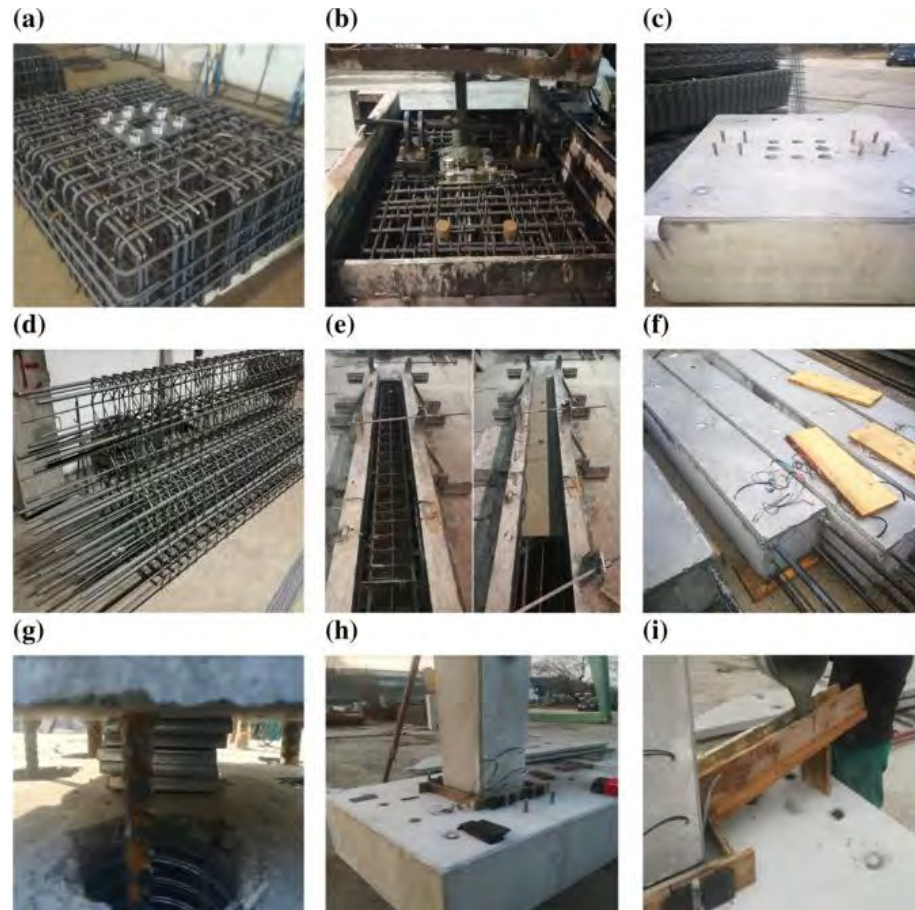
Precast concrete column horizontal connection casting process [39]
